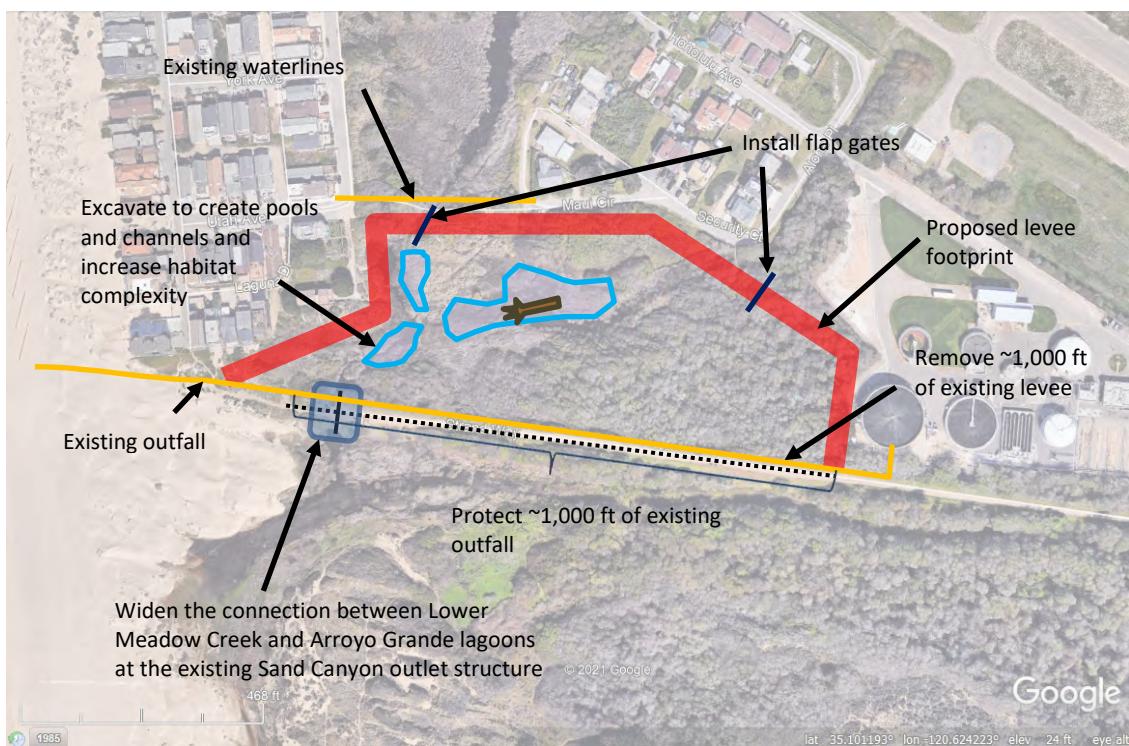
Alternative 2: Lower Meadow Creek Lagoon restoration with levee setback and outfall protection.
